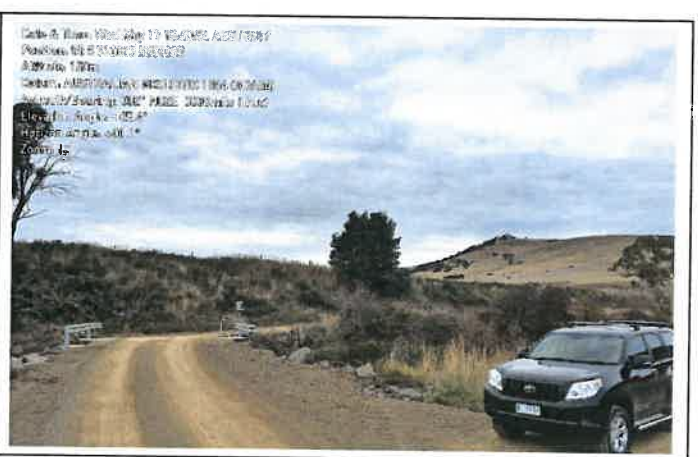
ACCESS ROAD JUNCTION LOOKING NORTH
